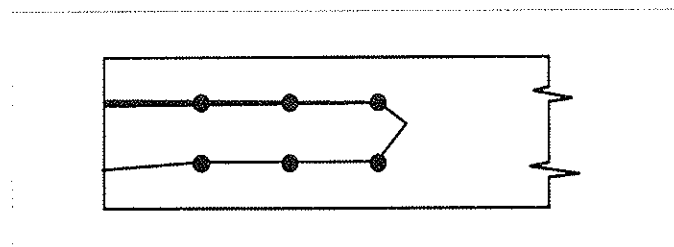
Typical timber failure in a multiple fastener joint as a combination of splitting, shear plug and tensile failure
